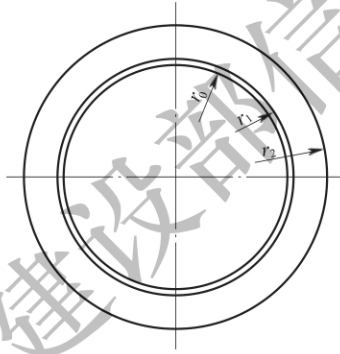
Inner steel plate cylinder and external concrete composite shaft lining
